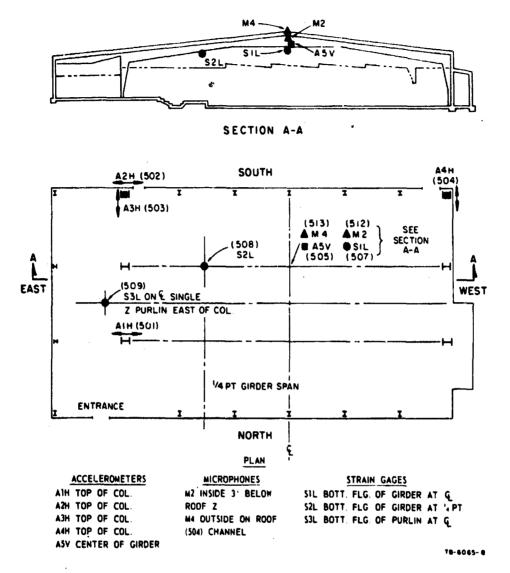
INSTRUMENTATION LOCATION, STRUCTURE E-3 ELEVATION AND FLOOR PLAN
